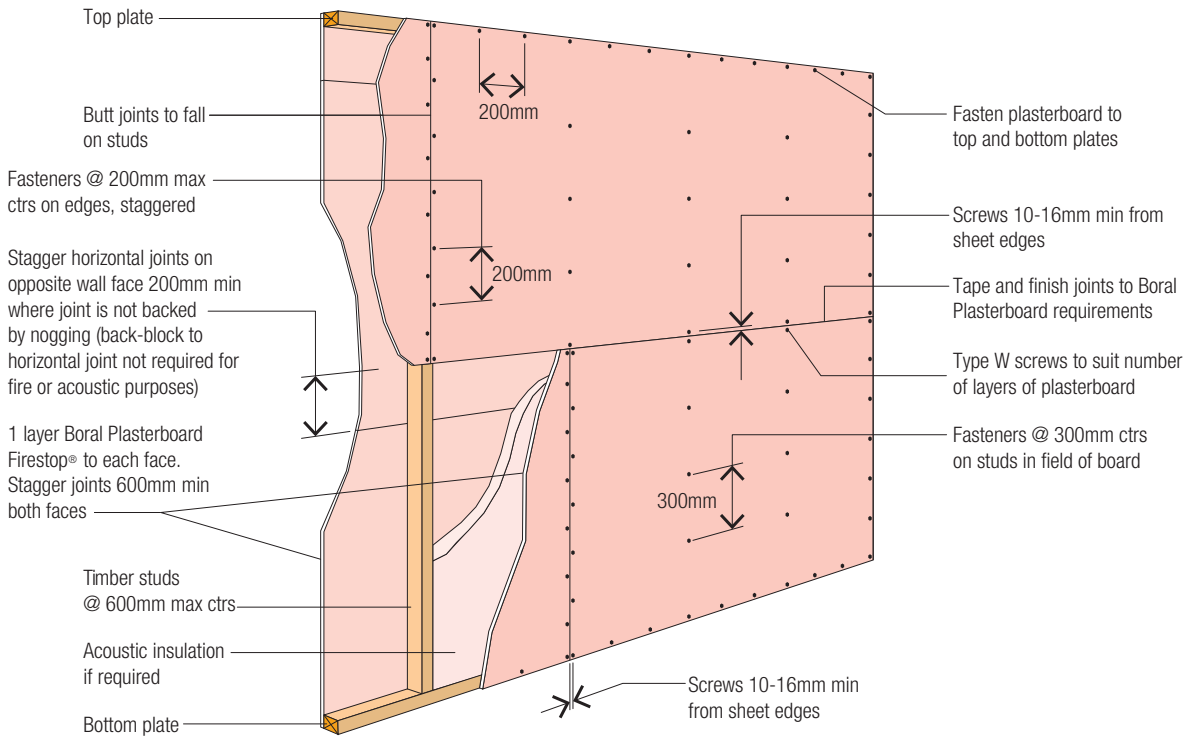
Fire Rated Timber Framed Wall - Horizontal Plasterboard Fixing (Single Layer)
